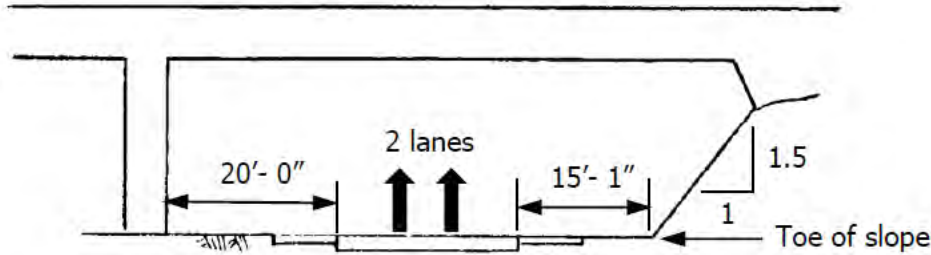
Bridge elevation view with one highway feature below the bridge carries 1-way traffic, looking in direction of traffic (Example 1)
